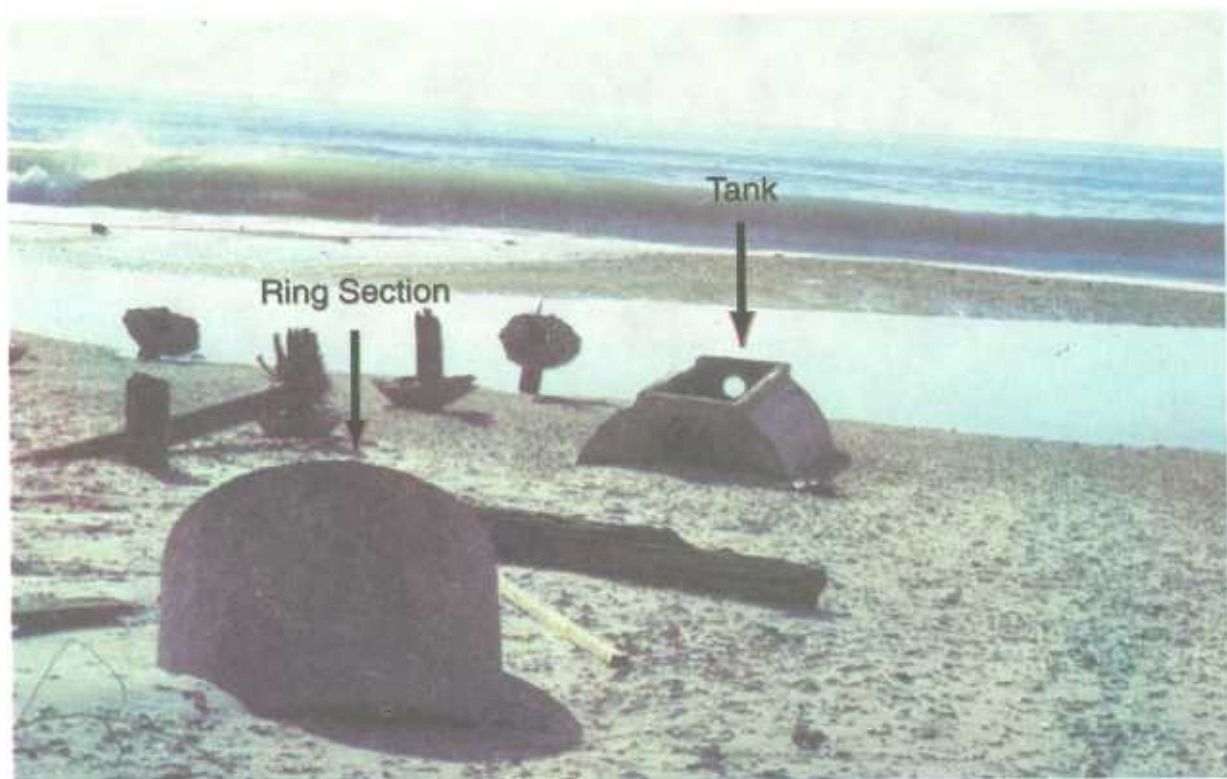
Oceanfront erosion and scour unearthing and damaging septic tanks and systems. Note precast ring section and precast tank.
